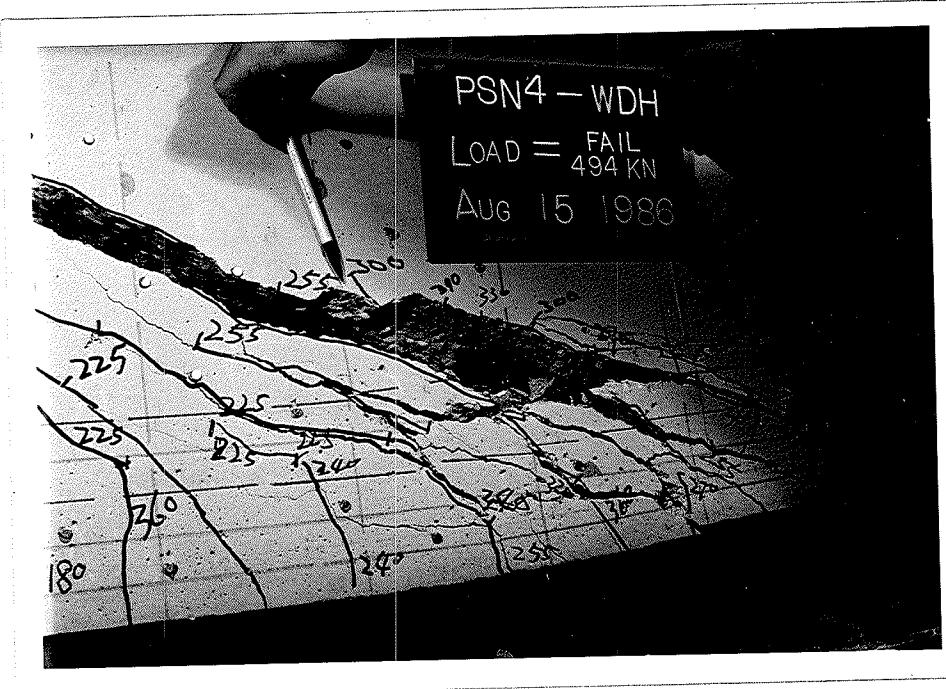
PSN4 Failure Crack of Beam PSN4-WDH
